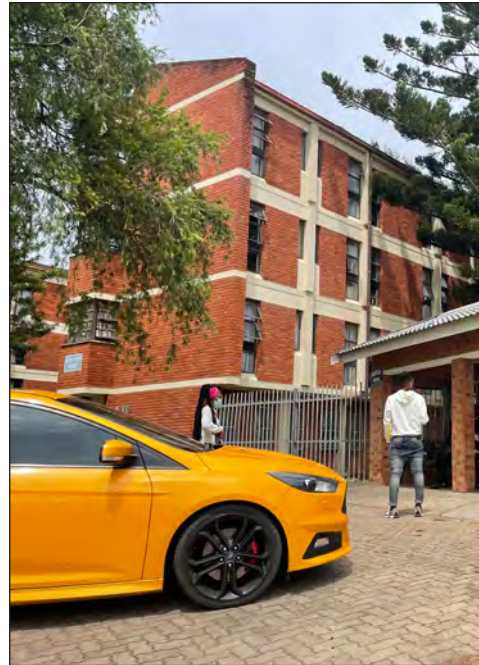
B: Residential buildings with face-brick, brise-soleil and concrete detailing. Similar to university residences built throughout the country at the time (Authors own).
